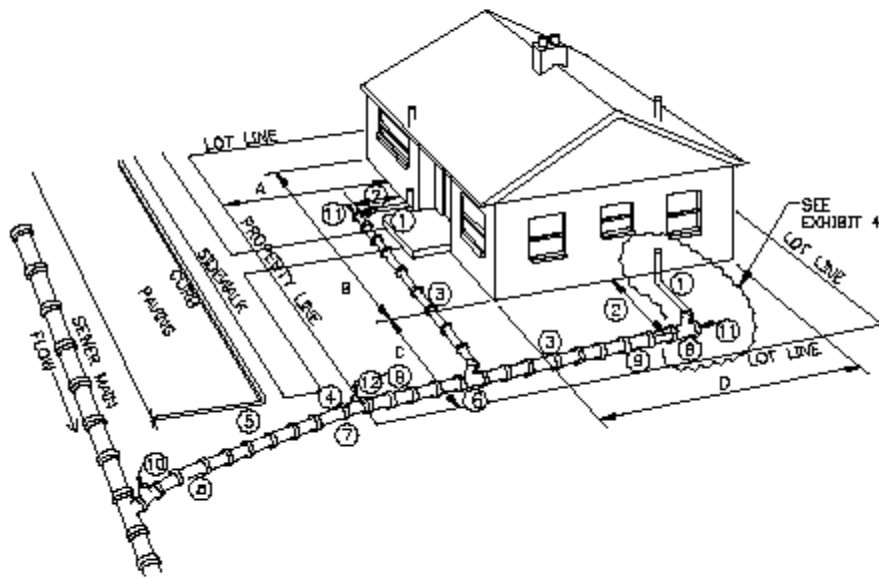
Side Sewer Installation Based On Standard Plan No. 283
